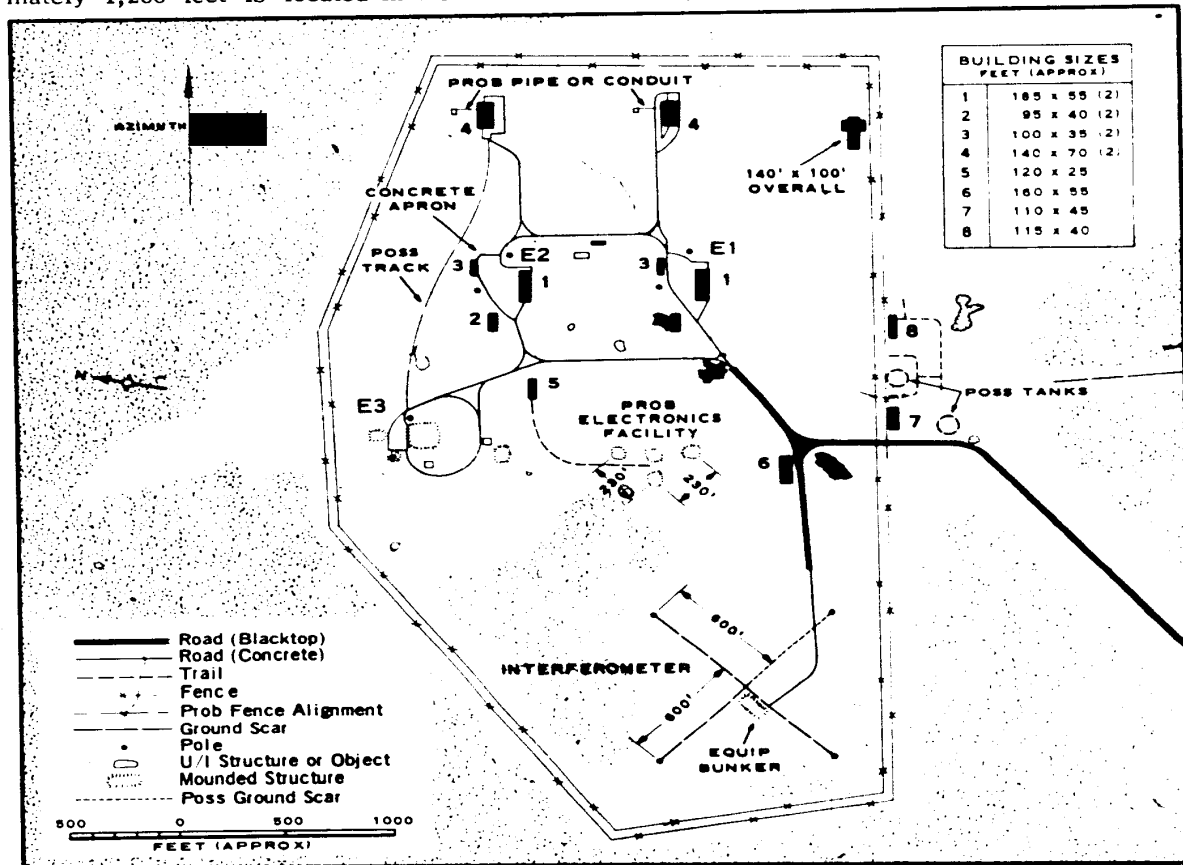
LAYOUT OF LAUNCH COMPLEX E.
